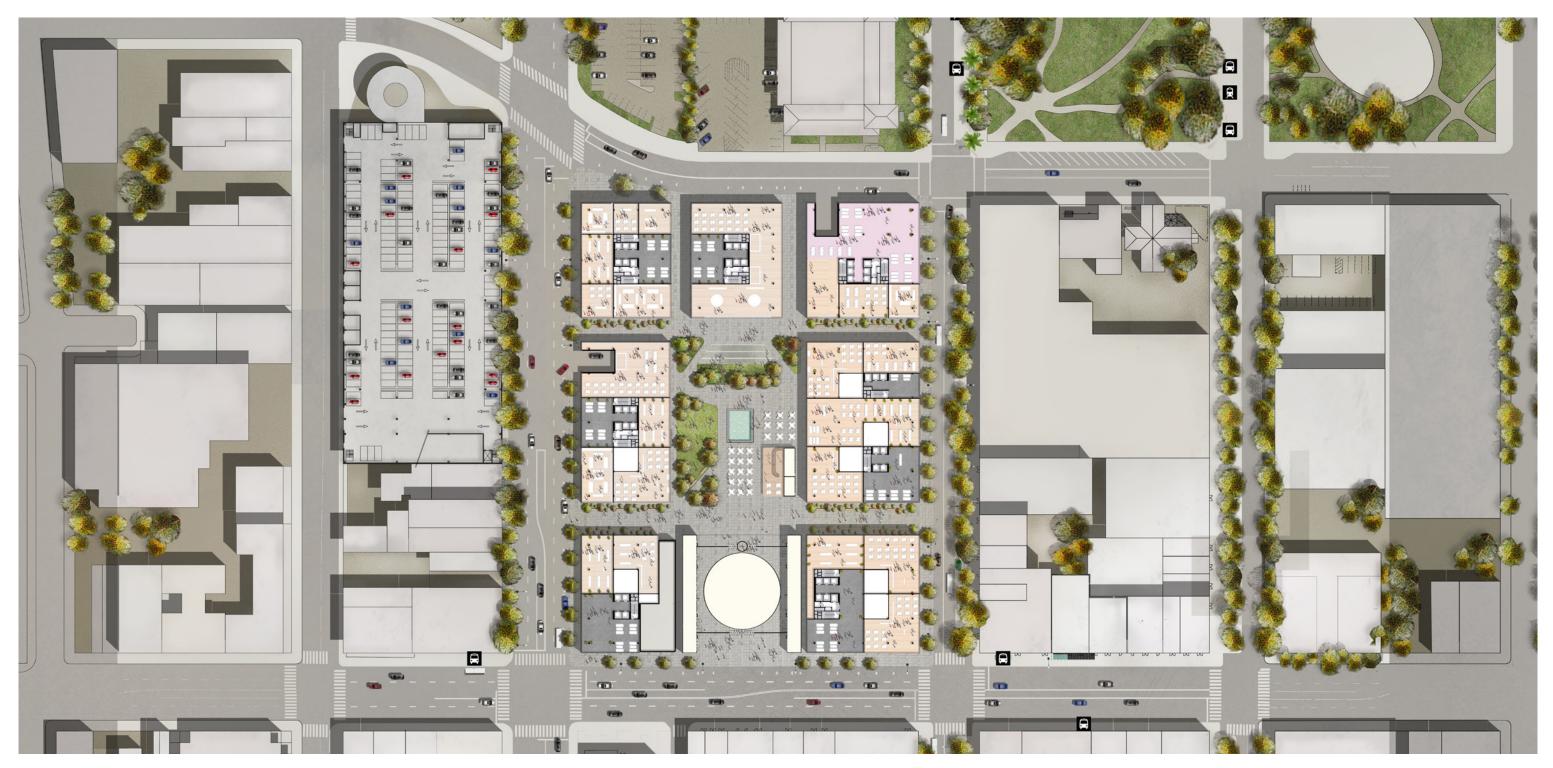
Proposed Site Plan Ground Floor (Not shown: TOD Above BART Station)
